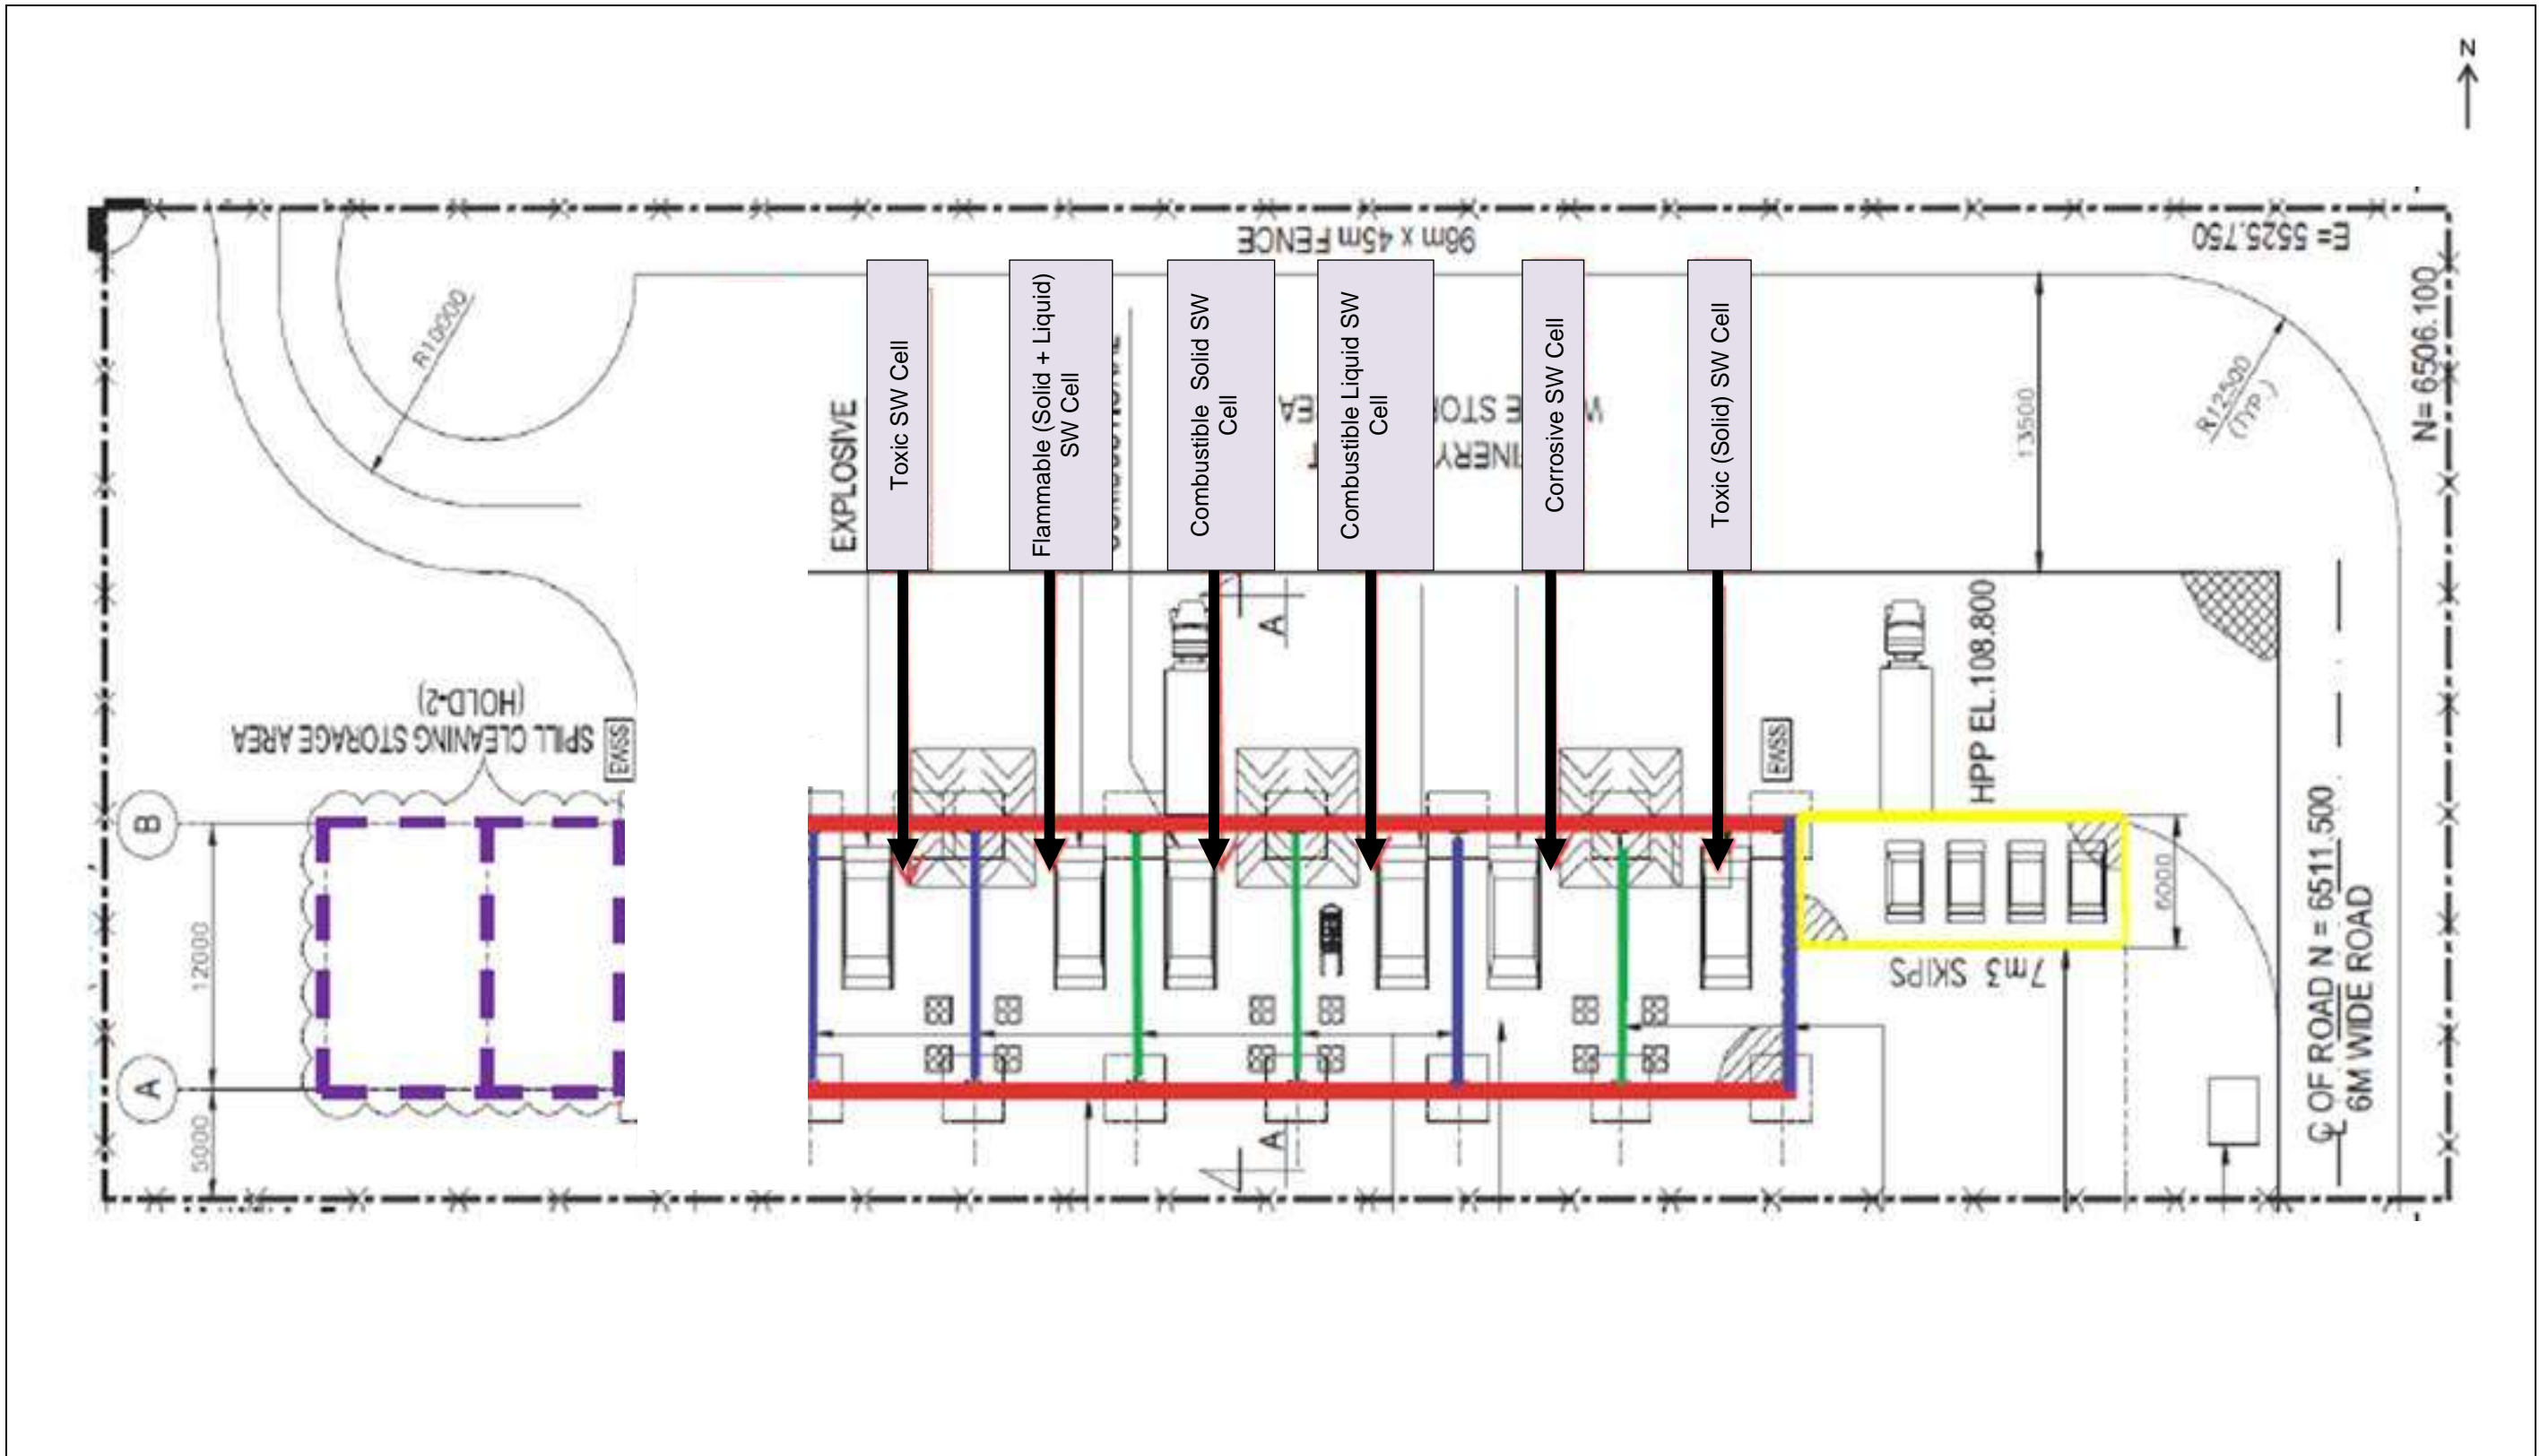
Proposed Schedule Waste Storage Area Layout Design
